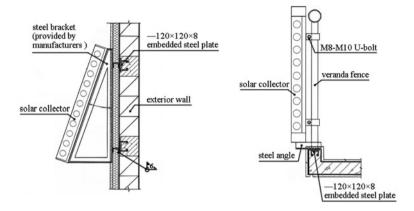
Two examples of detailed conformation design of solar collectors integrated on building envelopes vertically or at a certain tilt angle with no cantilevered slabs (06J908-6)
